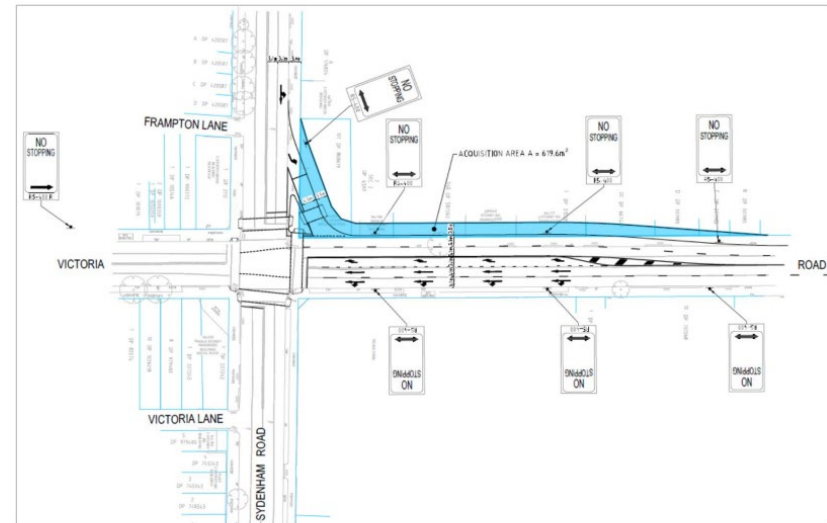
SVPA Victoria Road/ Sydenham Road Intersection Layout
